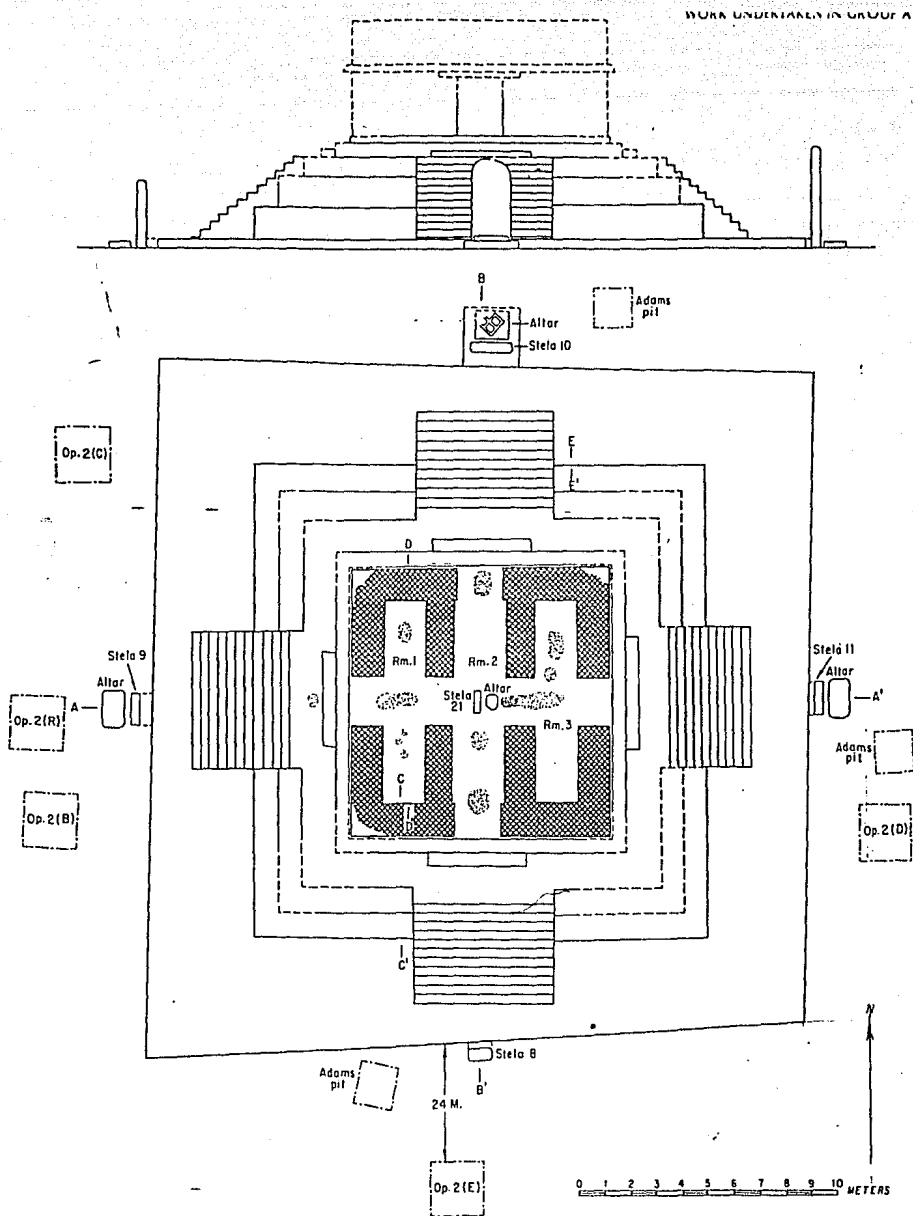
Structure A-3, plan and north elevation. Shaded areas indicate where floor was burned.
